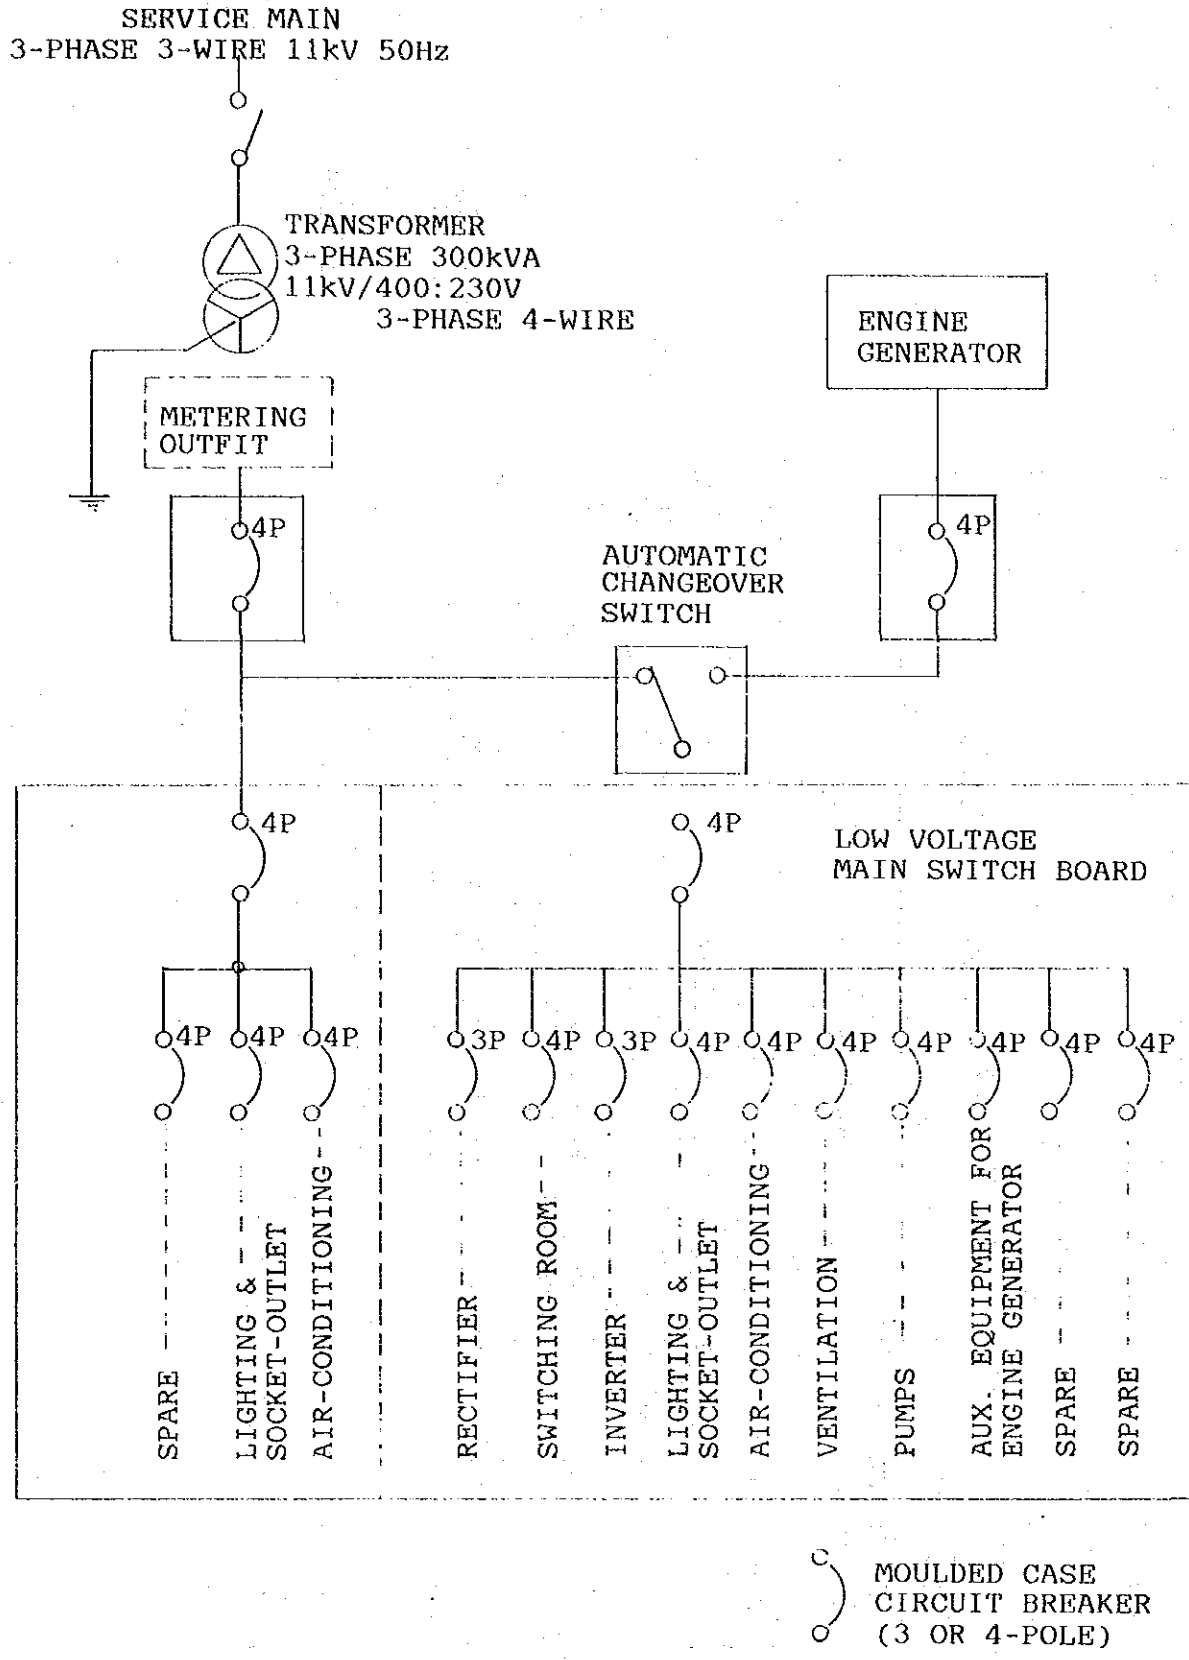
ELECTRICAL POWER SCHEMATIC DIAGRAM
